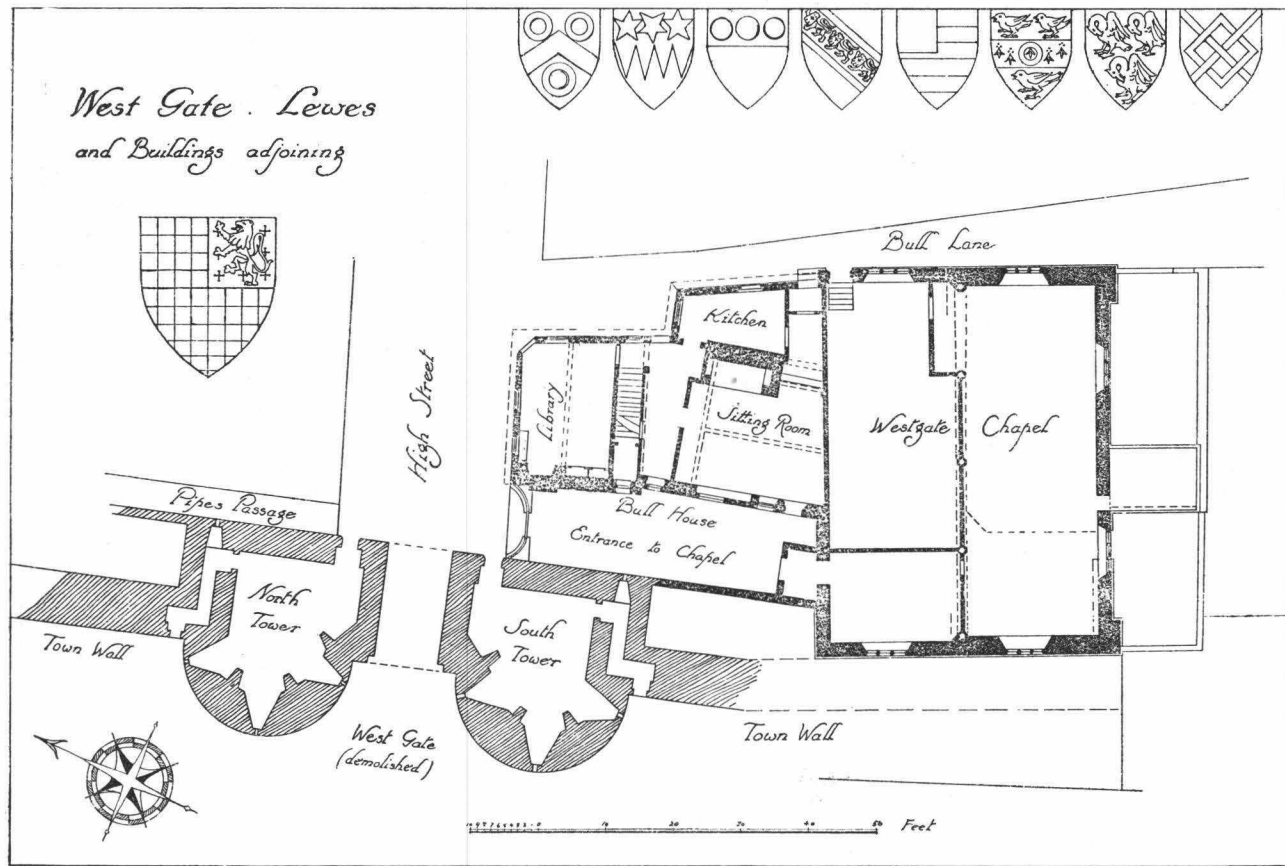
PLAN OF BULL HOUSE AND THE WESTGATE
